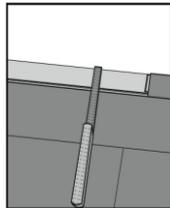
Last row (and perhaps also first row). The Minimum width of the last plank should be NOT LESS than 50 mm. Remember distance to wall is 12-15 mm. Tip! Put a spacer before measuring Cut the panels lengthwise and glue the short ends. See instructions below.
